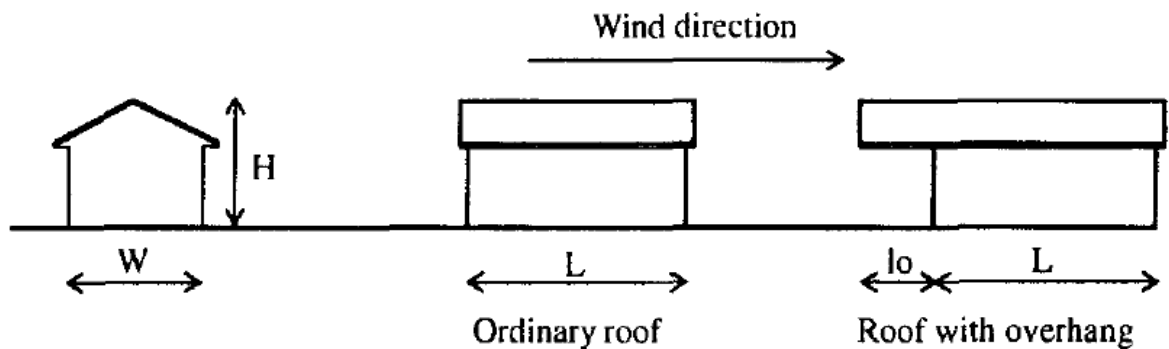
4: Sketch shows the side view and elevation for the building model (Wiik and Hansen 1997)
